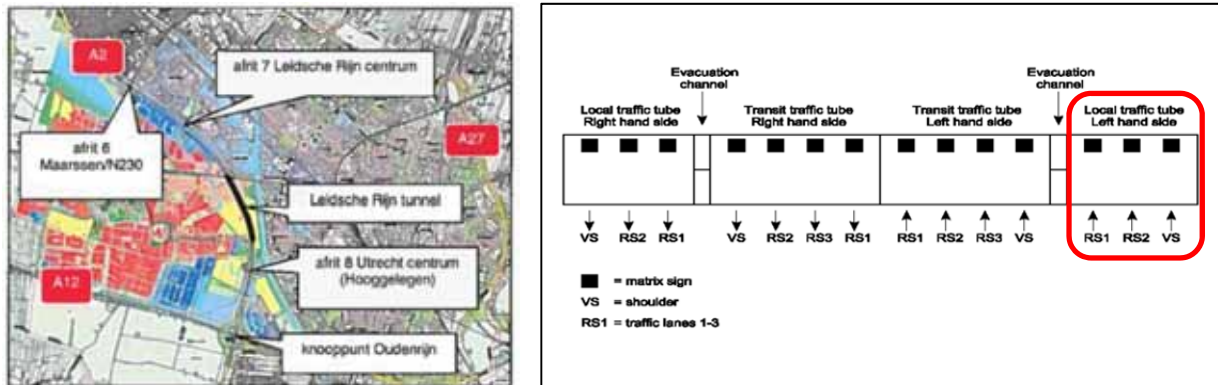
Location and cross-section of A2 Leidsche Rijn tunnel
